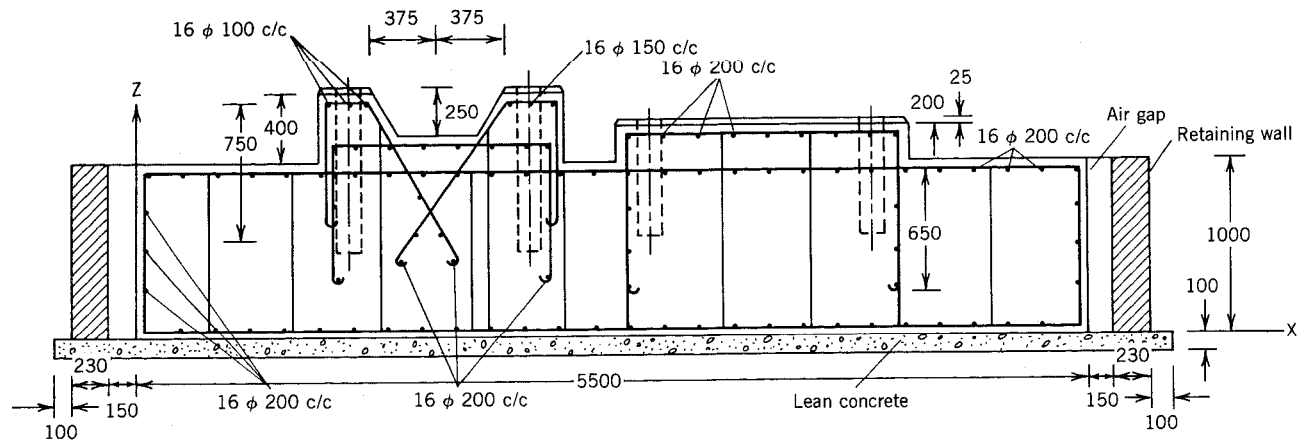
(a) Reinforcement details for a hammer foundation: (a) longitudinal cross section. (After Prakash and Gupta, 1970.)
